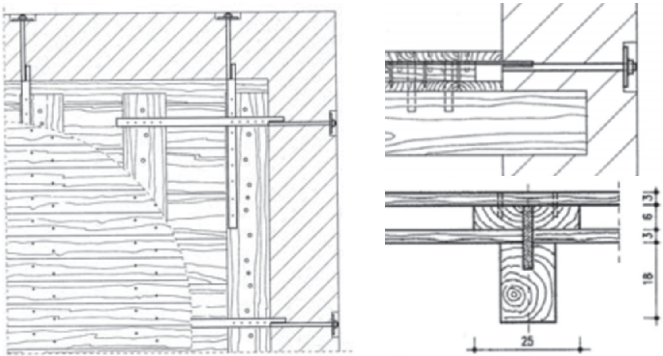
Sketches of the intervention executed in Ca' Cuodo: Drawing of the stiffening intervention by using dry hardwood pins to connect planks and/or boardings to the original timber floors, and details of the floor-to-walls connection (quotes in cm).
